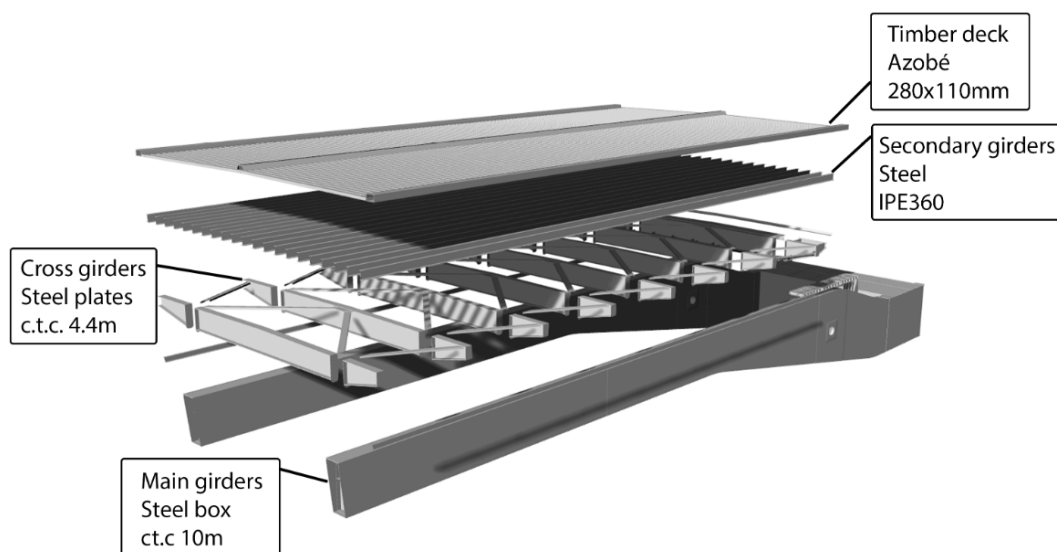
Exploded bridge structure of the Beneden Merwede bridge
